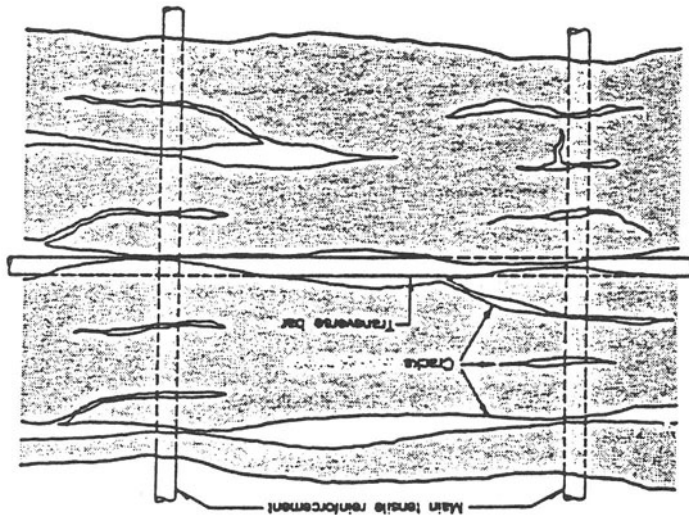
Alignment of cracking pattern relative to reinforcement on top of a slab.
